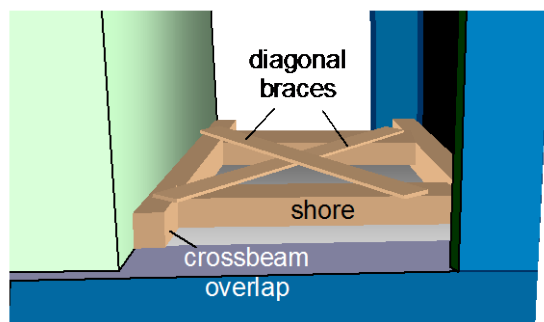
Shoring arrangement showing cross beam overlap and diagonal braces
